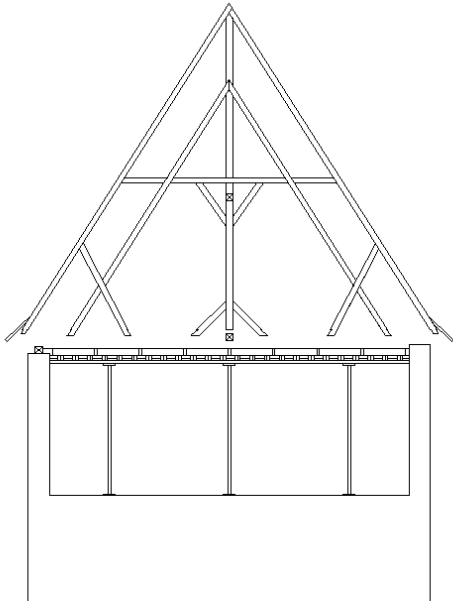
Connections removal, lifting of the truss to remove the two Tie-beams and its replacement for a new single one.
